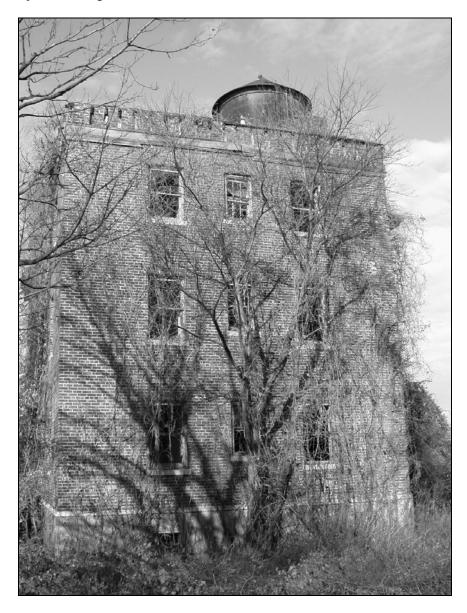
West façade, looking northeast. Standing behind Building 44 is the Water Tower (Building 45); in front is Building 42A, which is partially hidden by brush.
